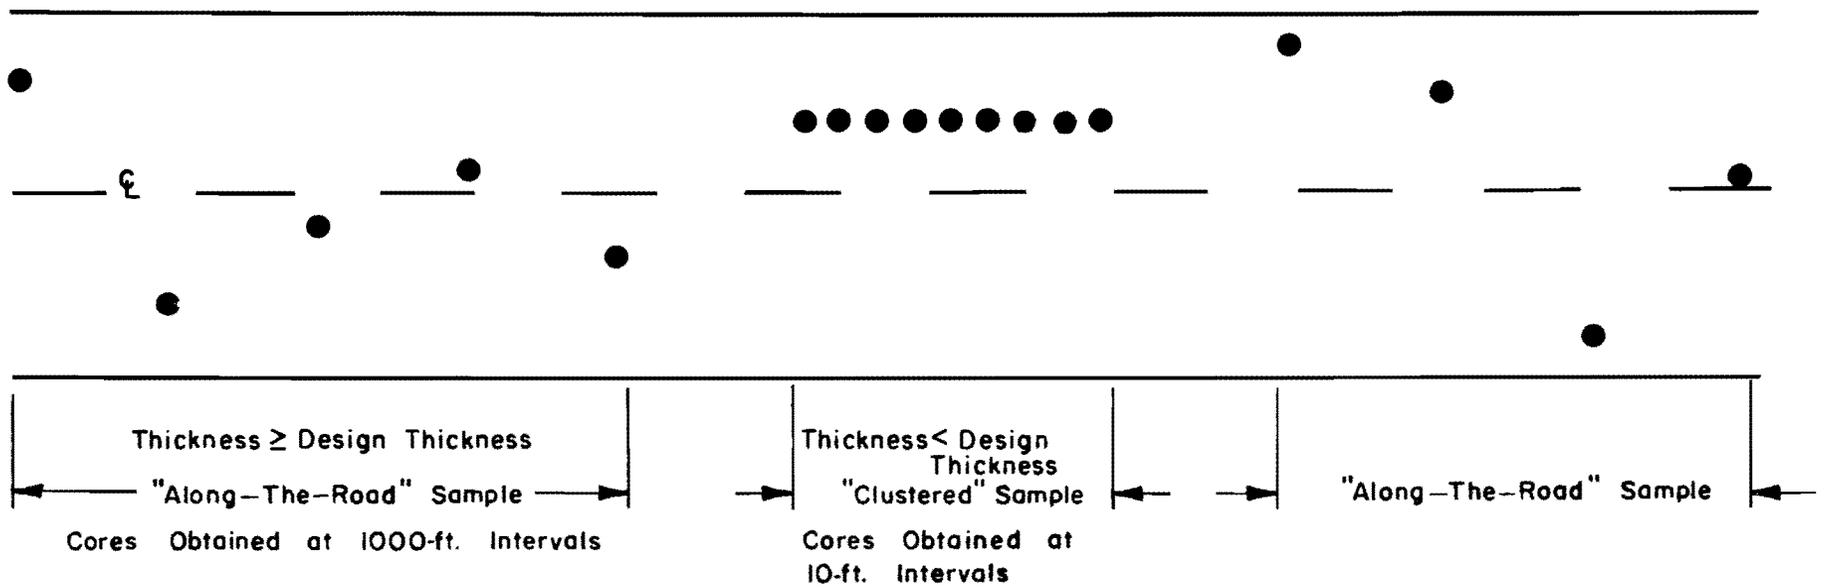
Typical core sampling plan used by the Texas Highway Department for concrete pavements.
